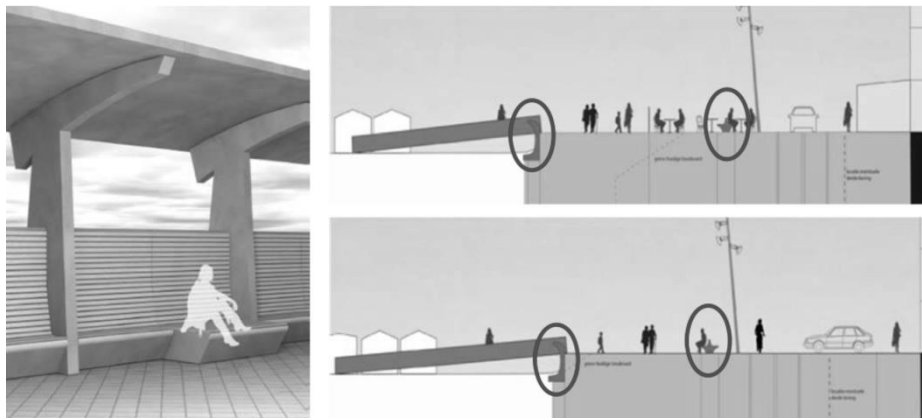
Artist impression of the new infrastructure necessary for the Wenduine storm wall: “Rotunda” (left), 10 m widening in the western part (above) and 3 m widening in the eastern part (below).
